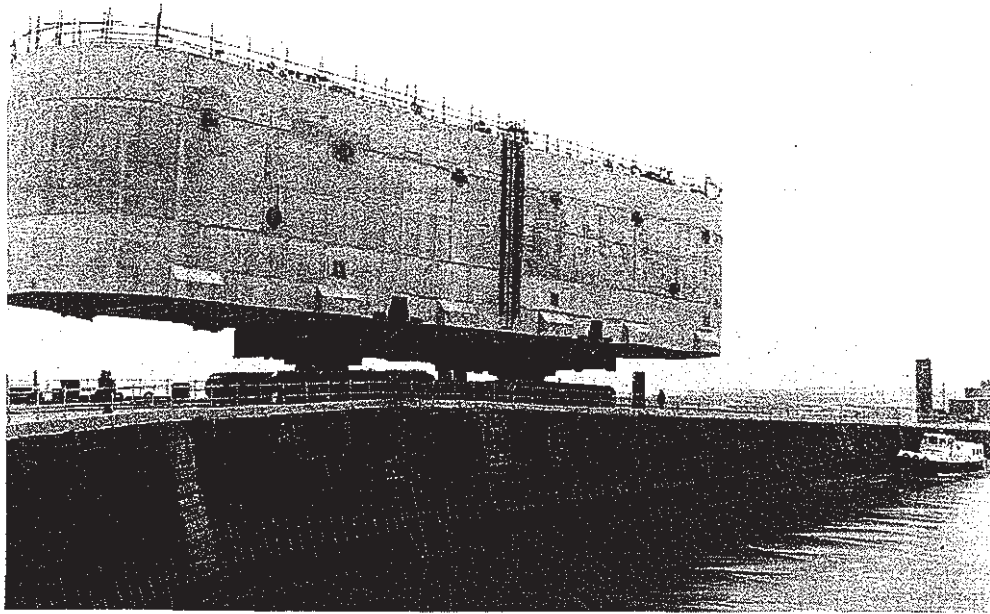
2600 tonne load supported by Reinforced Earth ramp
